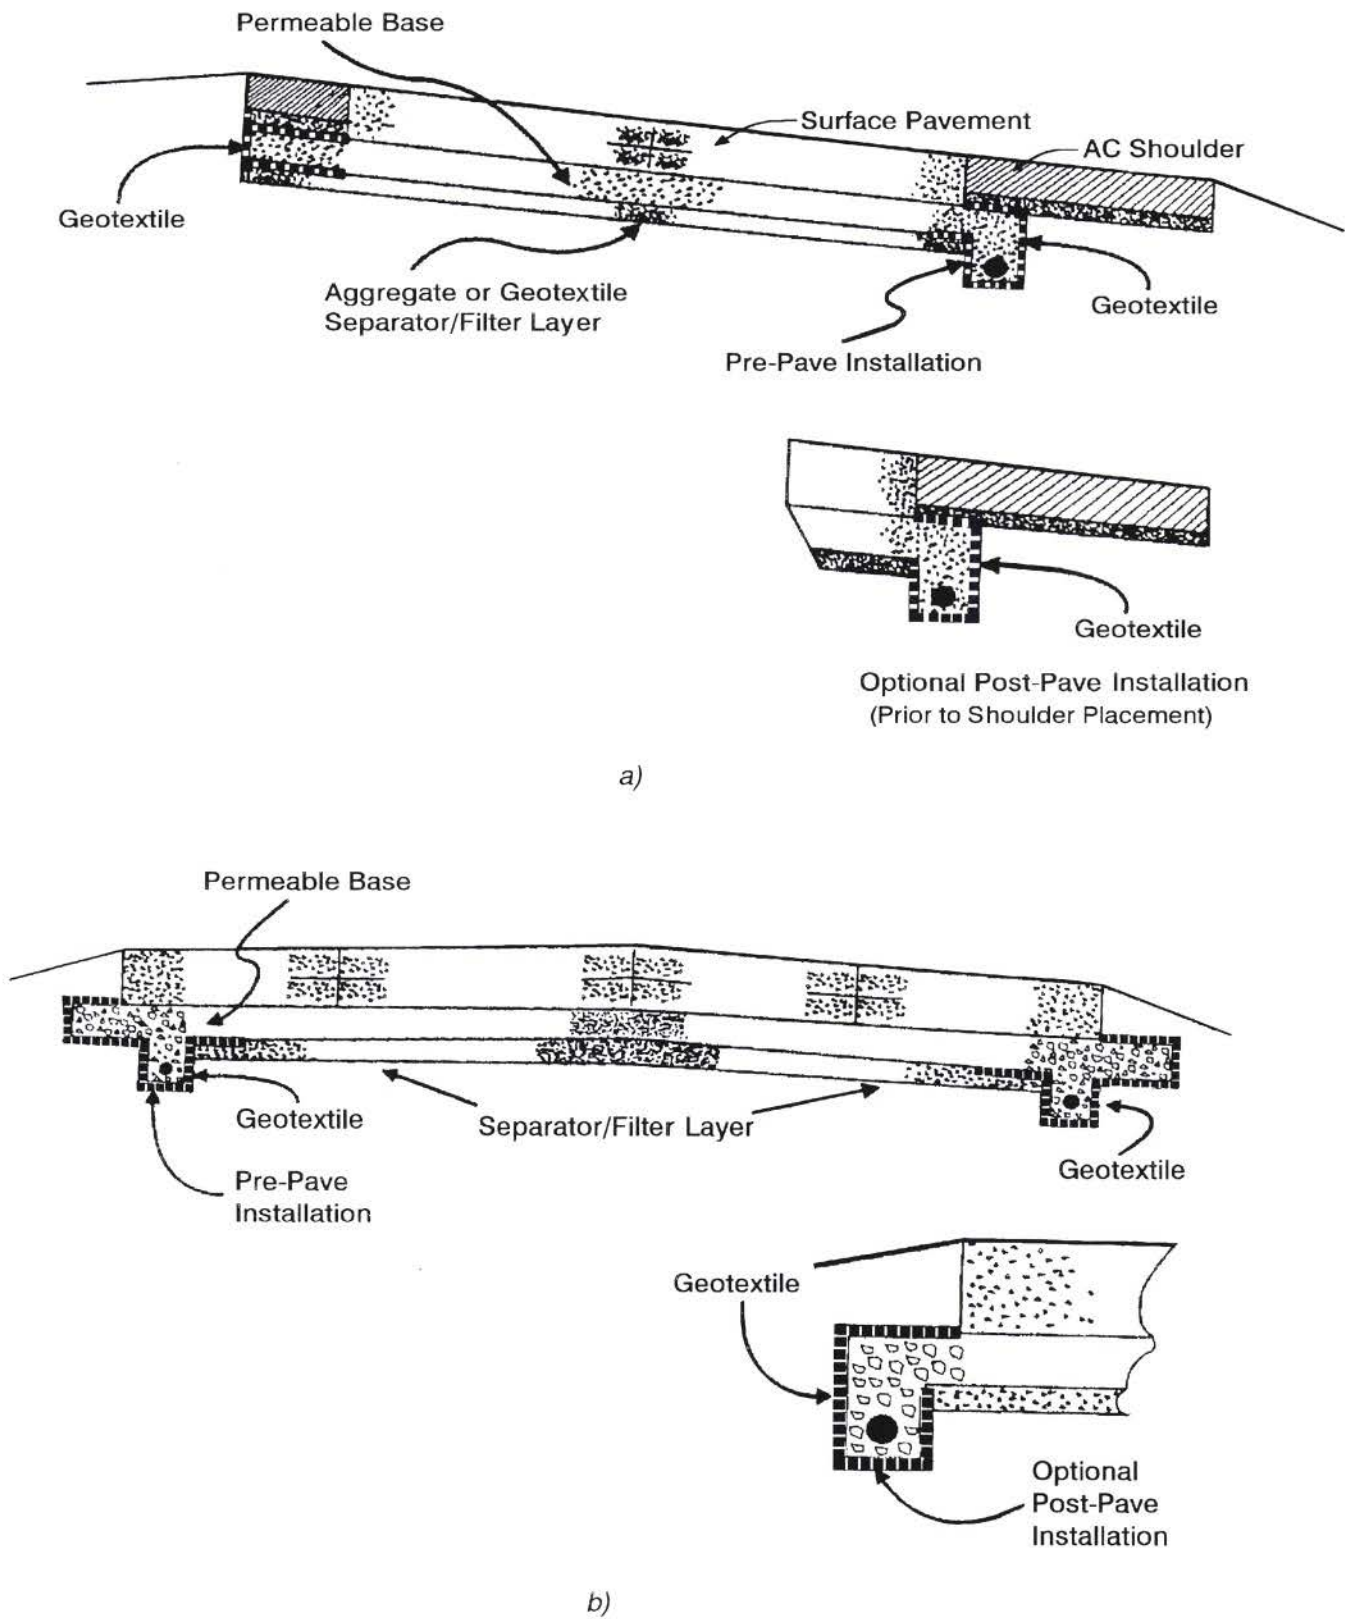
Typical edgedrain installations with open-graded base: (a) installation for portland cement concrete or asphaltic concrete surface pavement with asphalt shoulders (after Ridgeway 1982 and FHWA 1992); (b) installation for portland cement concrete surface pavement with tied concrete shoulders (FHWA 1992).
